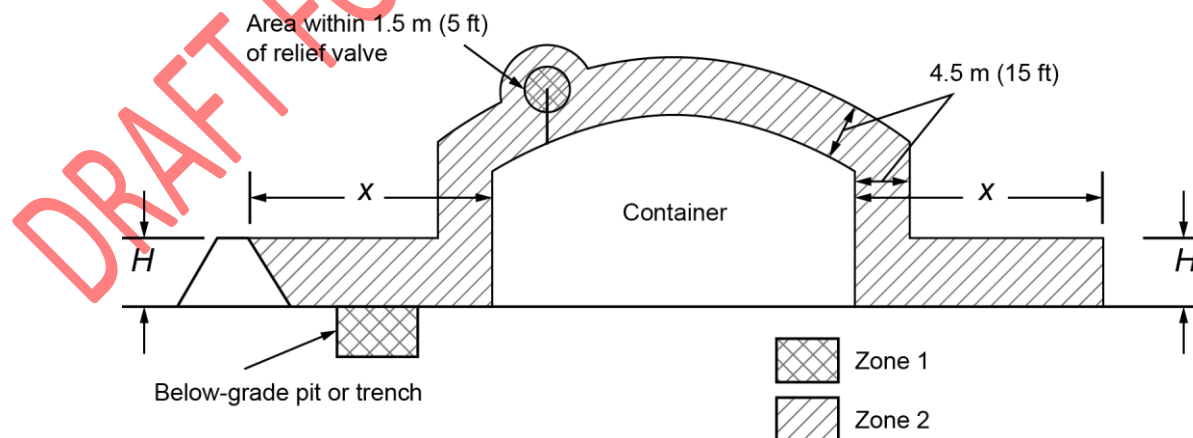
Above-ground, Single Containment LNG Storage Tank with Secondary Containment Provided by Earthen Dike or Concrete Wall (where $H < x$) (See 14.4.1)
